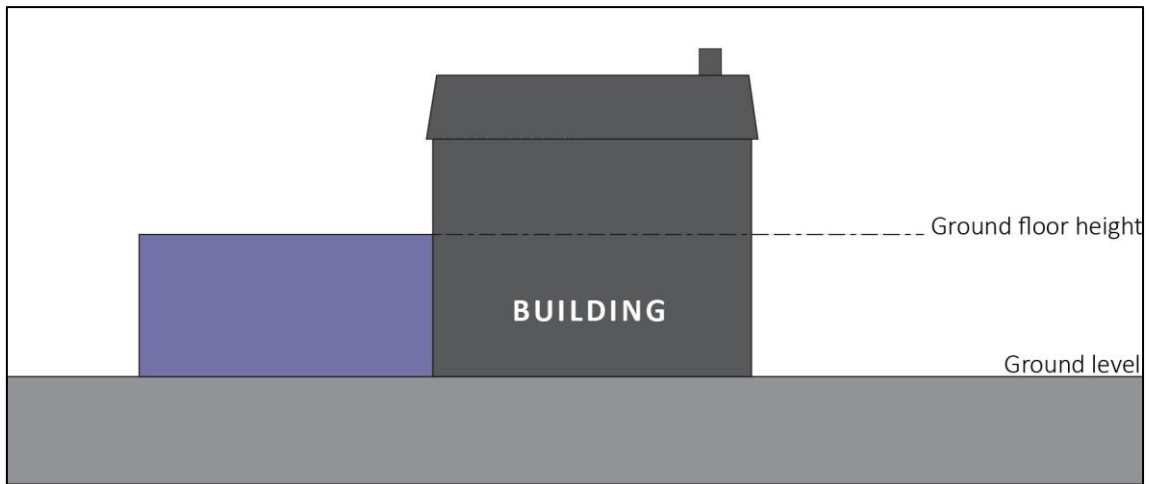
Construction of a single-storey addition or extension to an existing building is exempt if the walls of the addition do not exceed the ground floor height of the existing two-storey building; note this graphic does not indicate or specify the form of the roof to the addition
